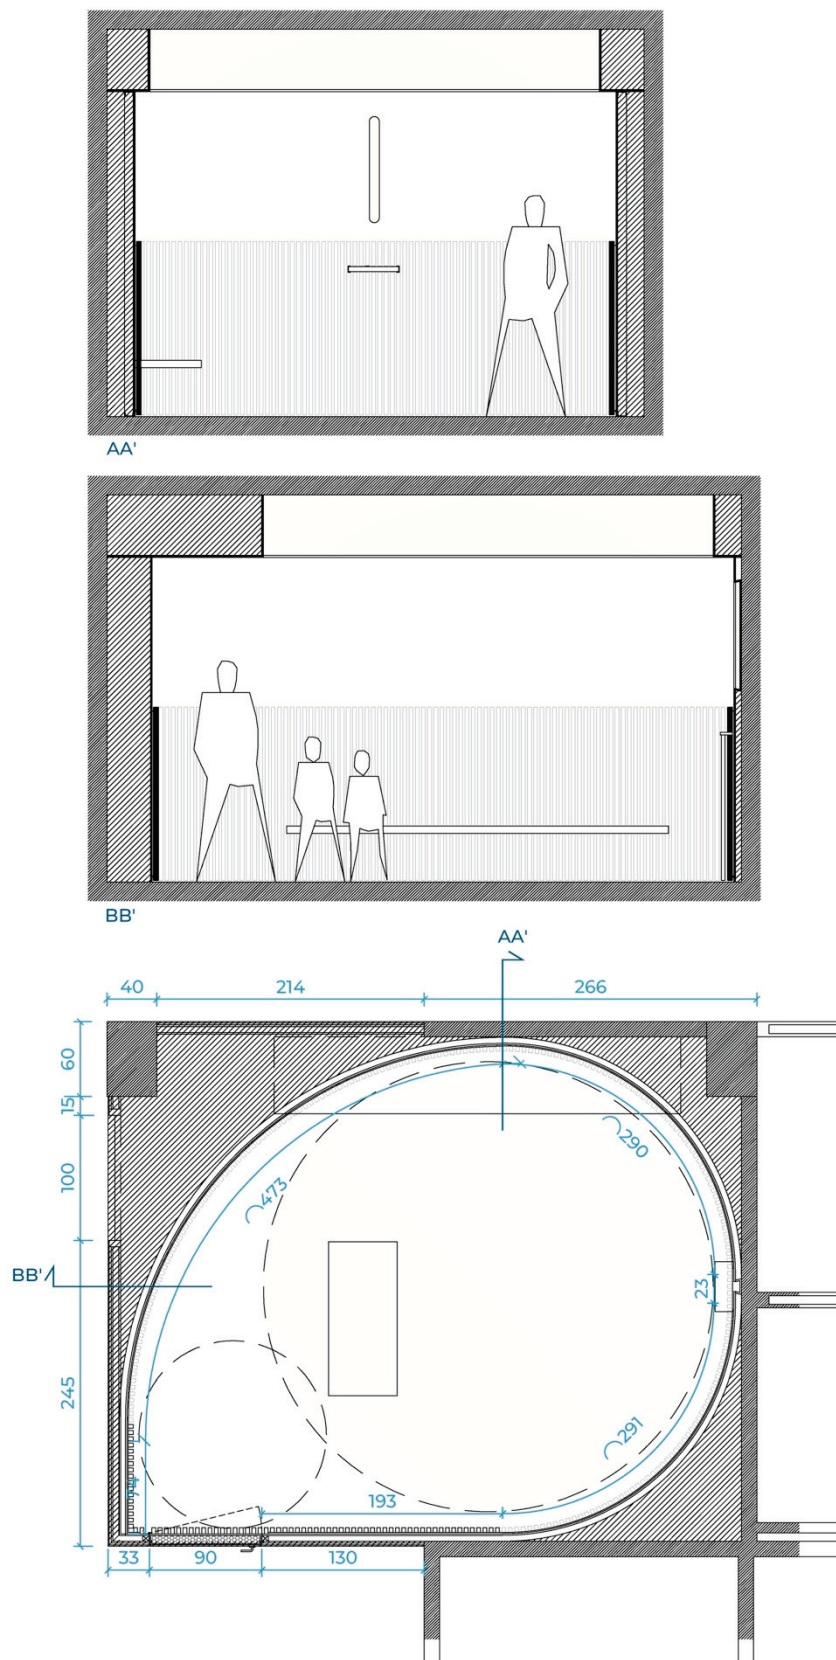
Silent Space floor plan and sections (units in centimeters). CAD documentation provided by OVICUO.
